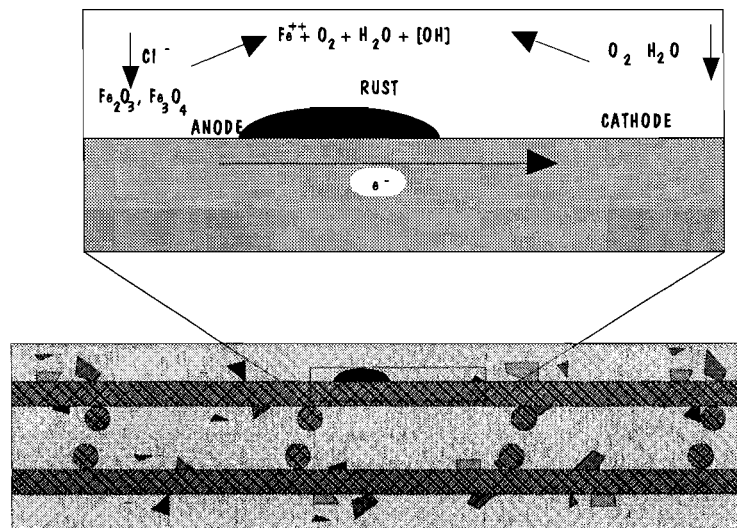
Electrolytic Corrosion of Reinforcing Steel in Concrete
